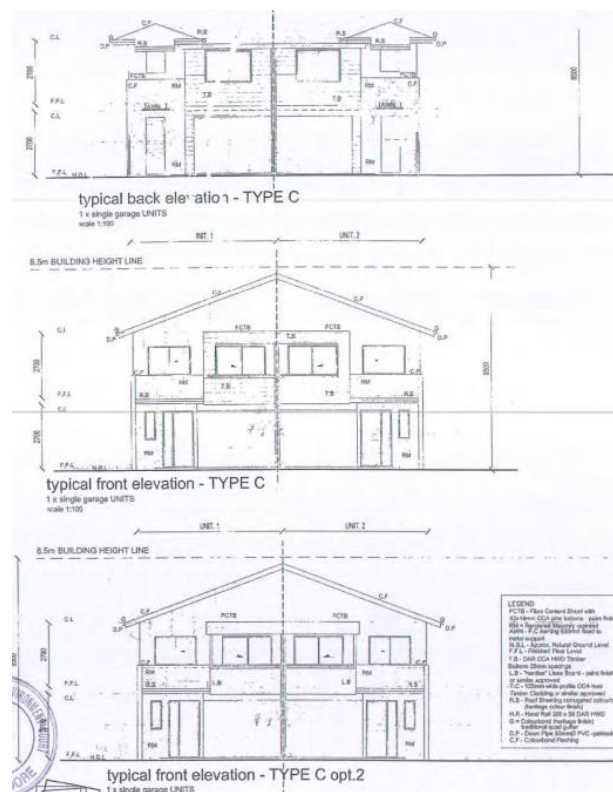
Approved Elevation for Multiple Dwelling (extract)
